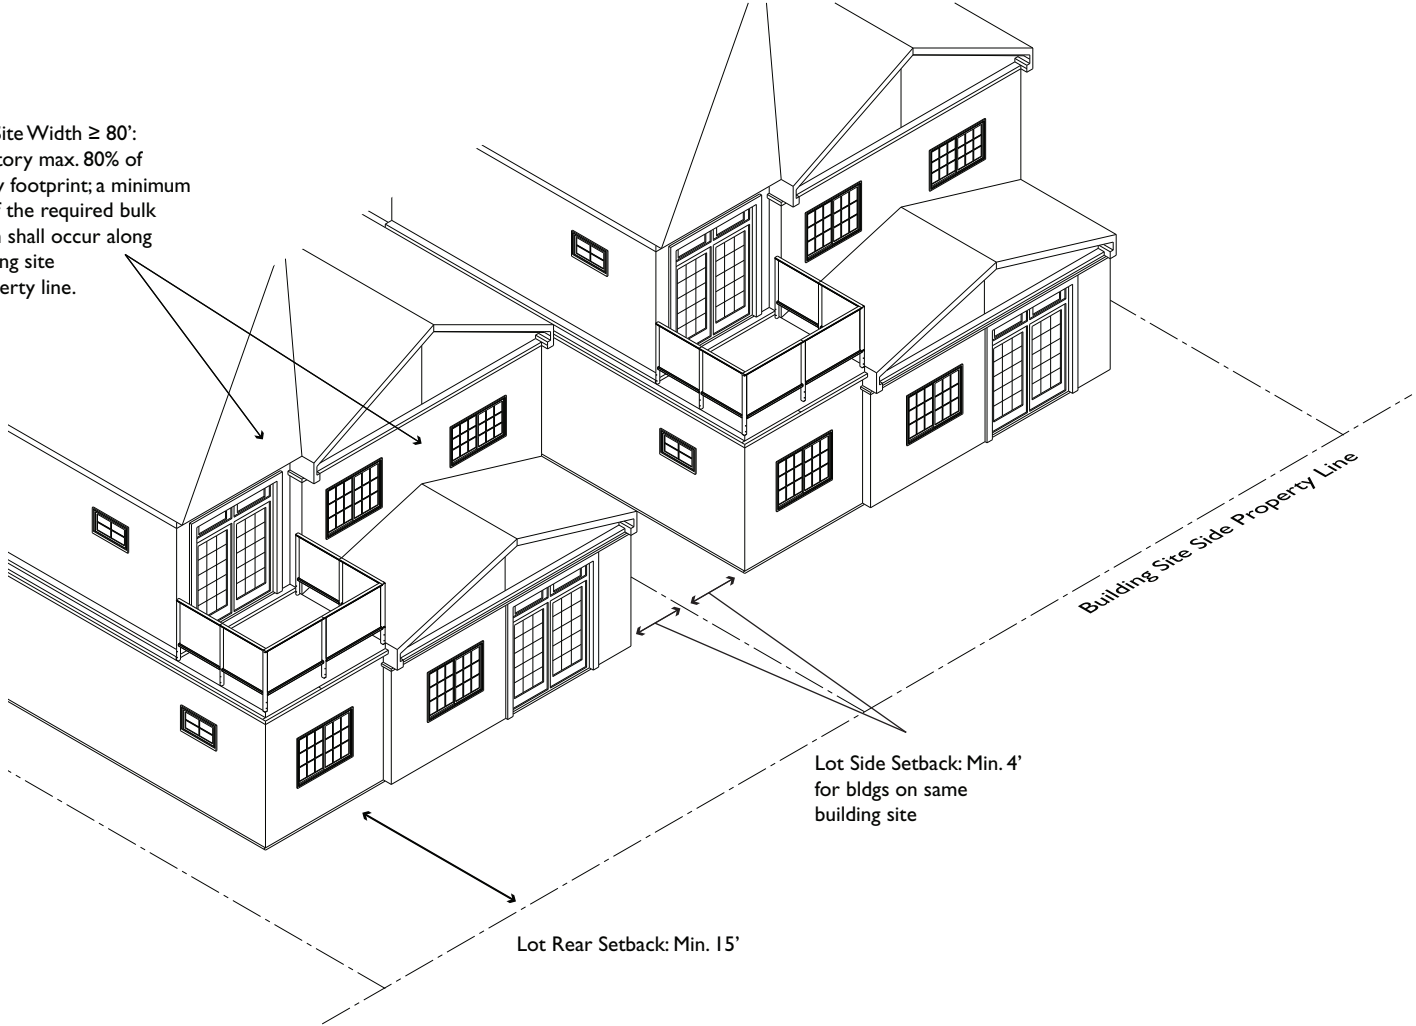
Small-Lot Single-Family: Minimum Distance Between Buildings
